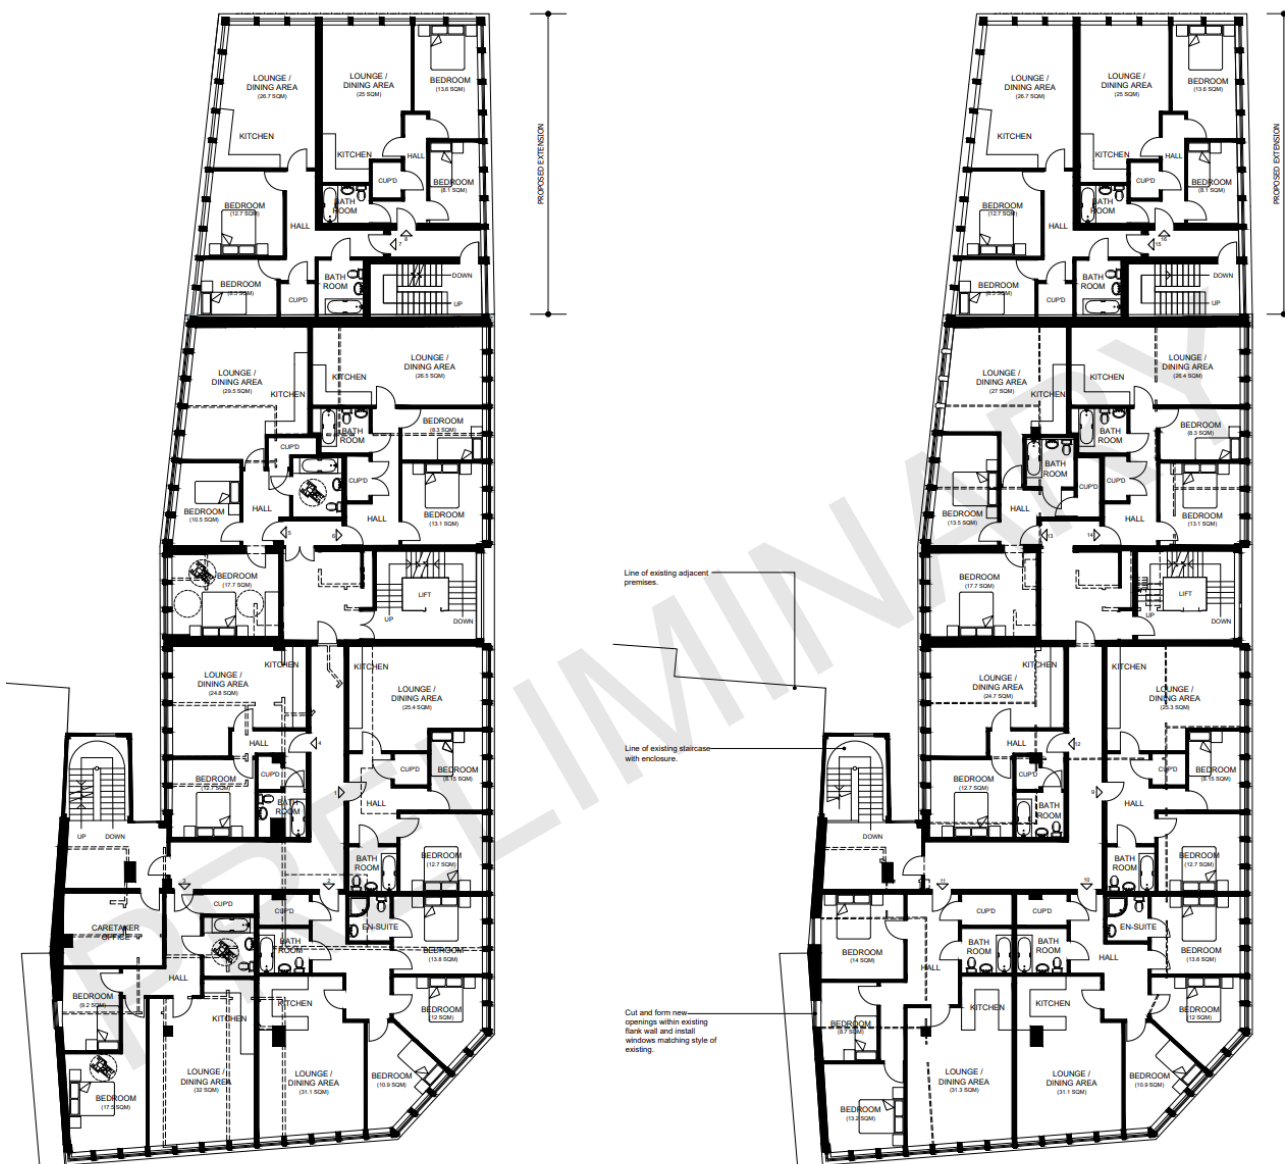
Architectural Drawings of Proposed First and Second Floor
